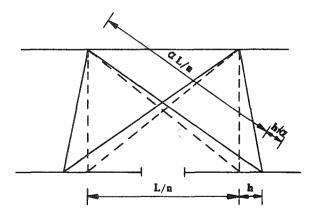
Plan View of the Bottom Lateral Bracing Model for the Load
